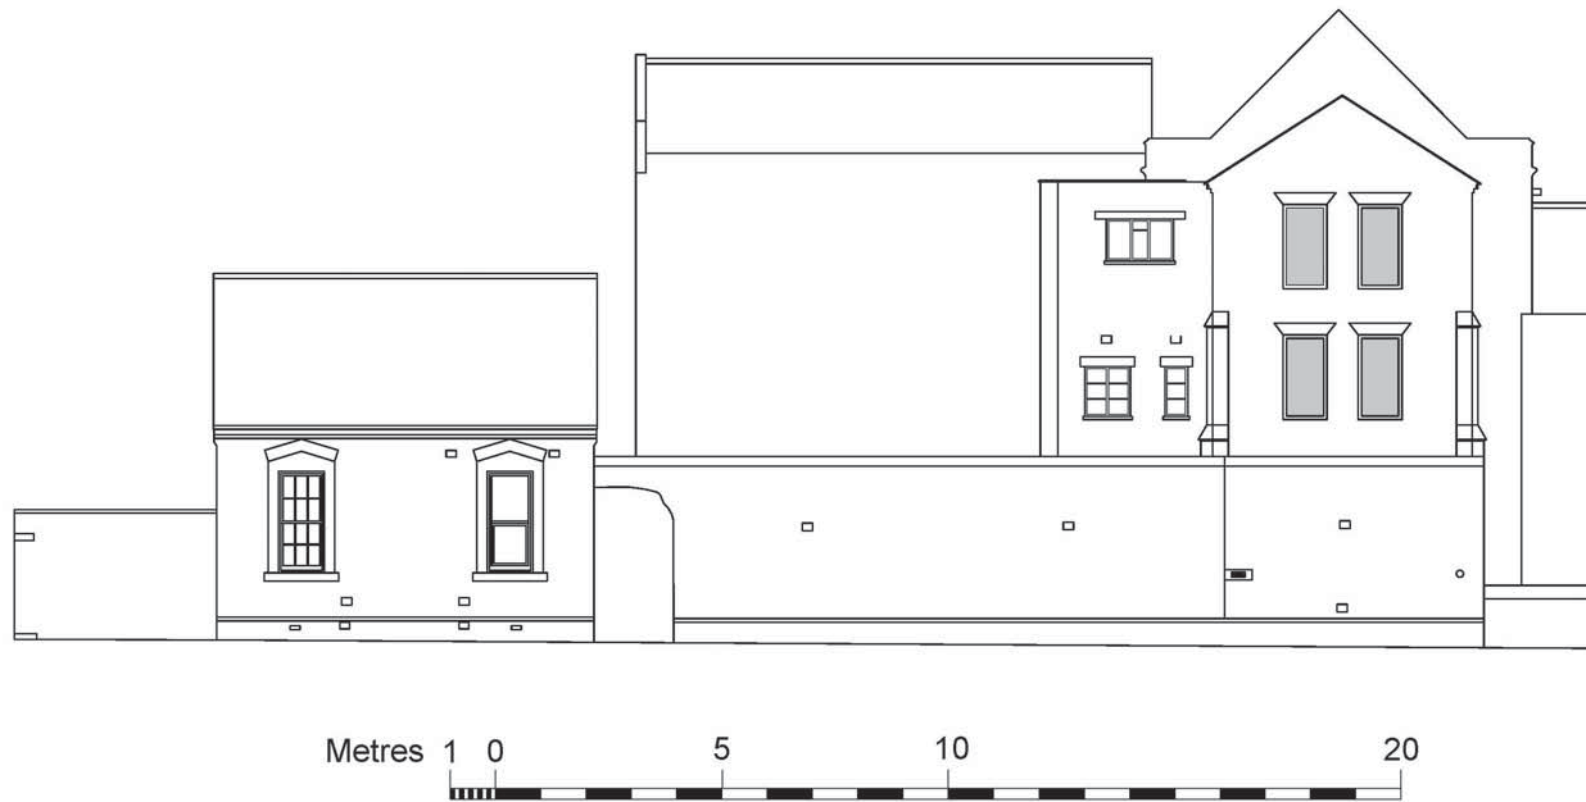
St. John's, surviving boundary wall along Pleck Road
